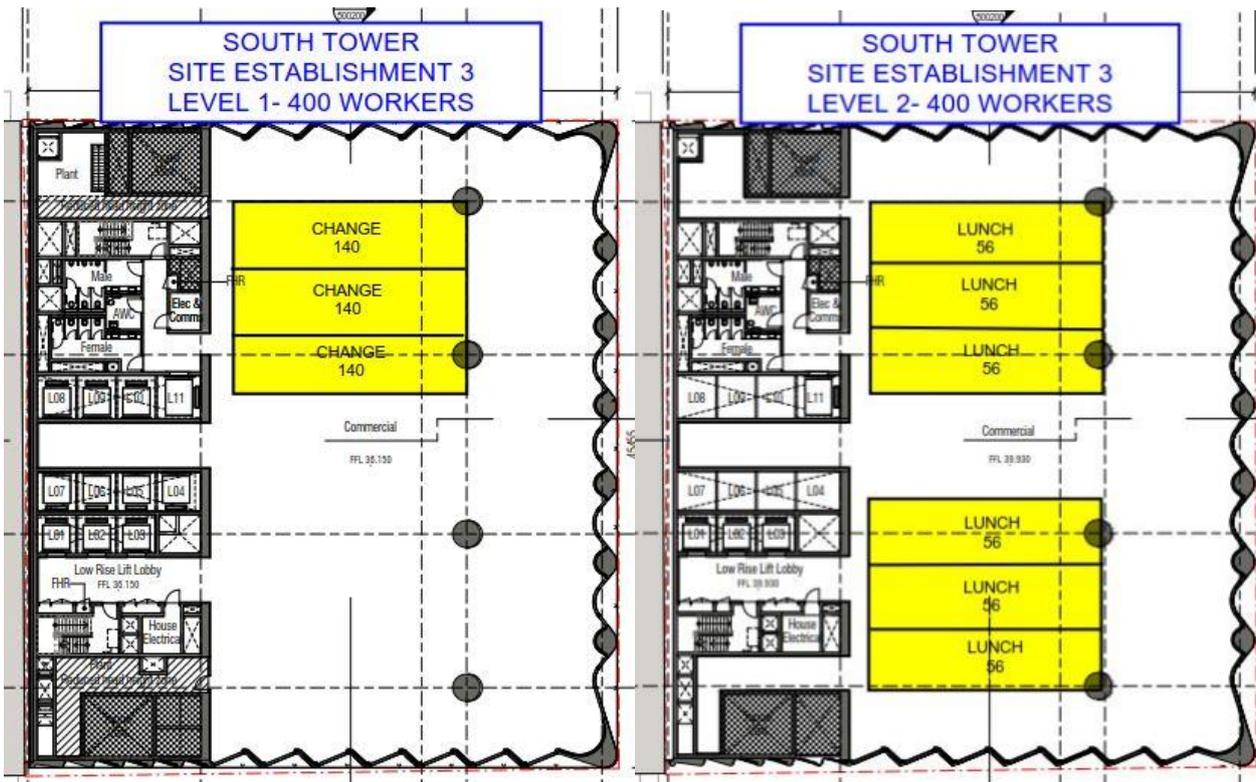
South Tower - Internal Site Accommodation on L1 & L2 (IMAGE UNDER REVIEW)
